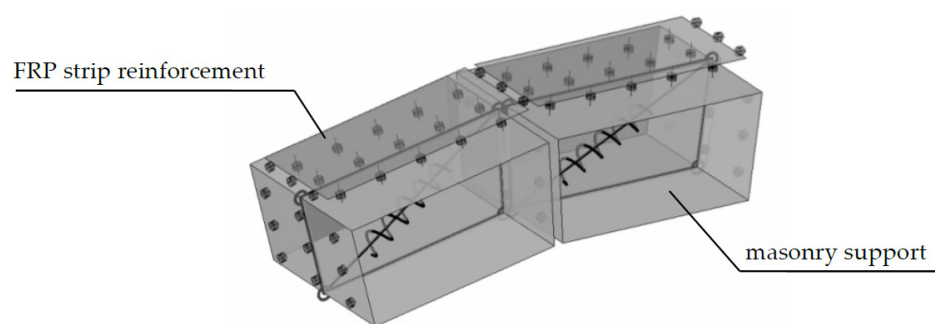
Schematic layout of the interaction between masonry elements and discrete fabric-reinforced polymeric (FRP) reinforcement elements.
